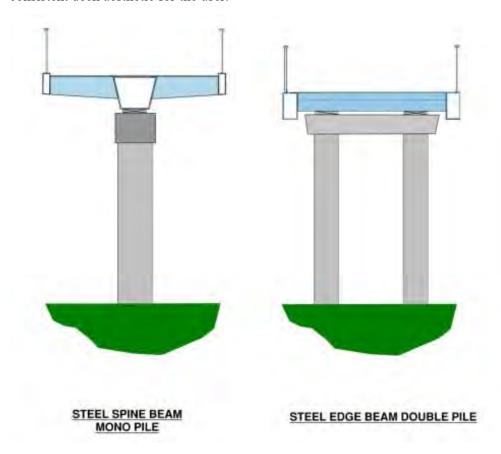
Indicative cross sections of steel elevated ramp structural forms
